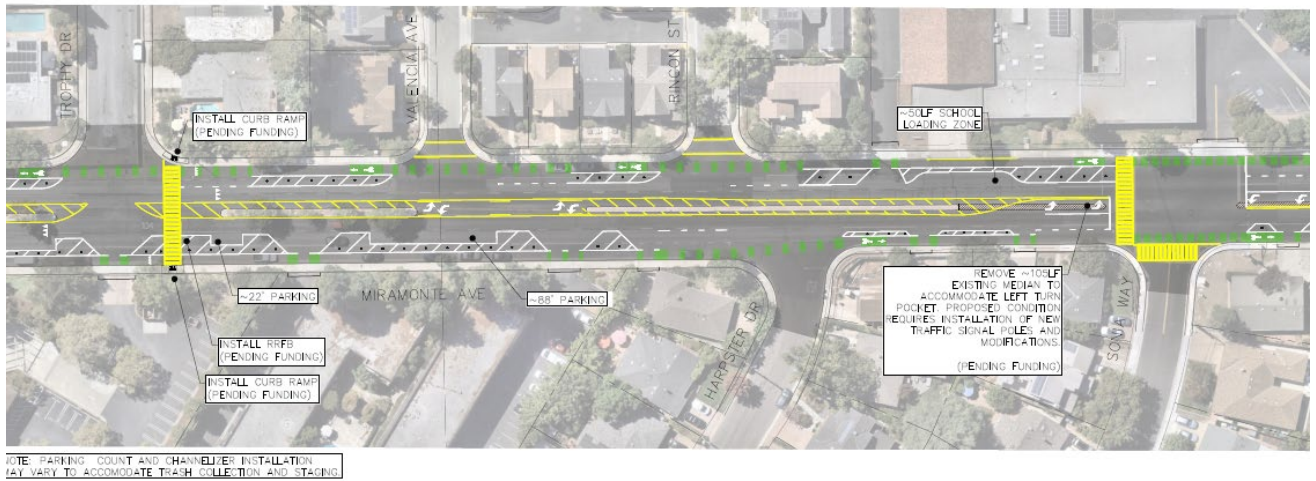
Preferred Plan E. Park Drive to Trophy Drive
